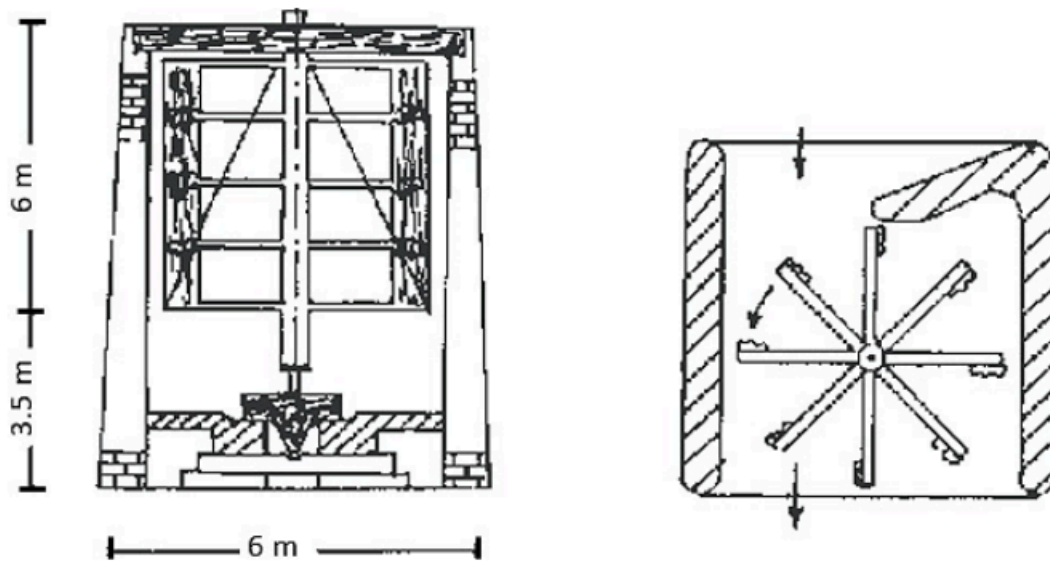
Side view (left) and top view (right) schematic of a windmill in Sistan
